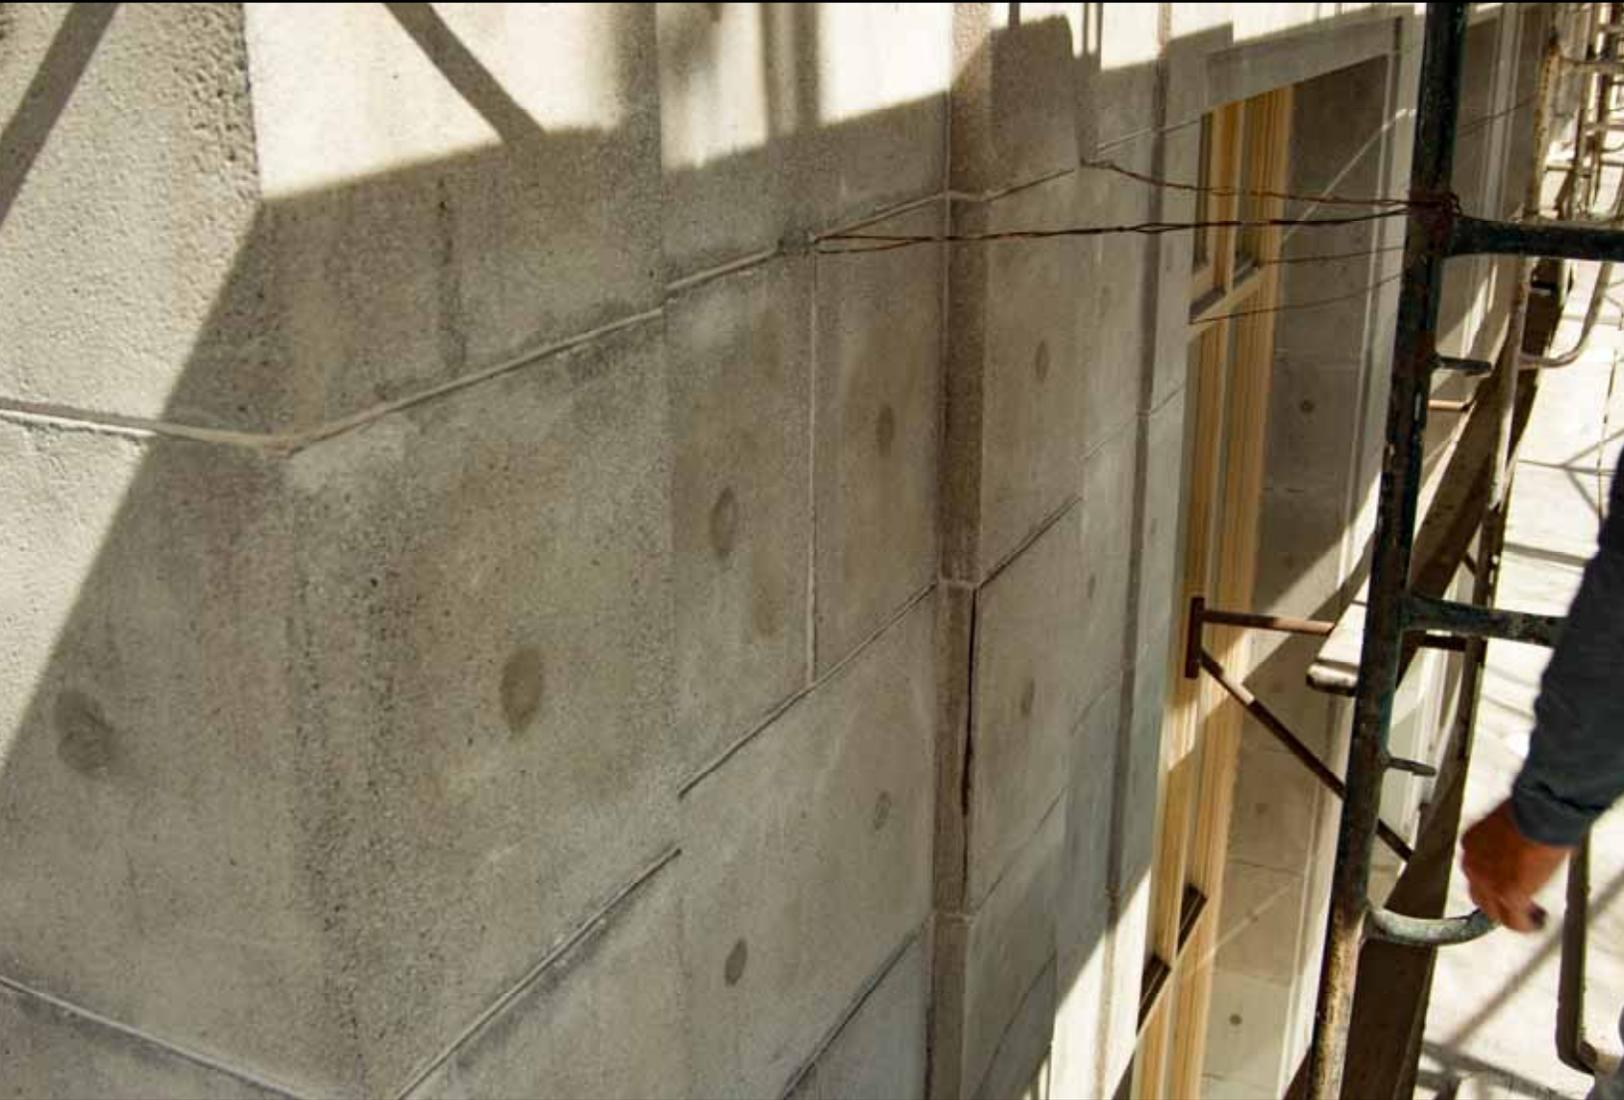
, above. Image of the precast cladding with the filled bolt head cavities.
